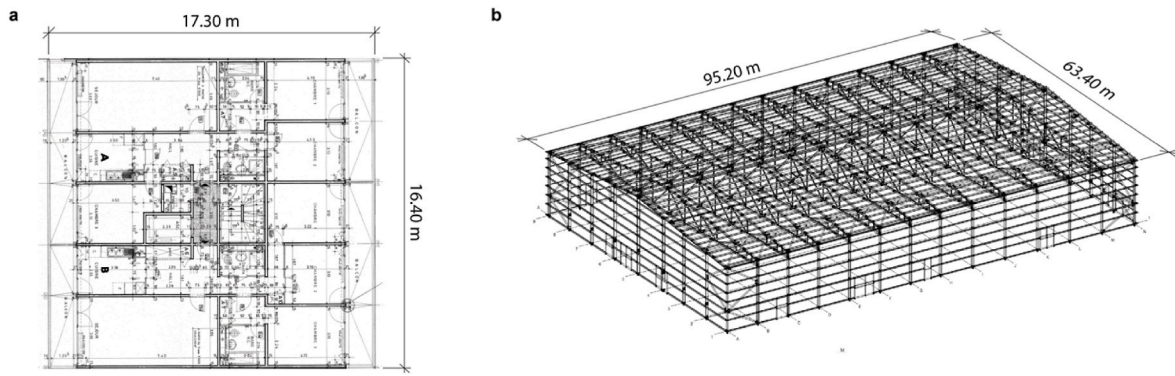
Donor buildings for the case study: (a) RC donor building block (typical floor plan) and (b) steel-profile donor structure (axonometric drawing).
